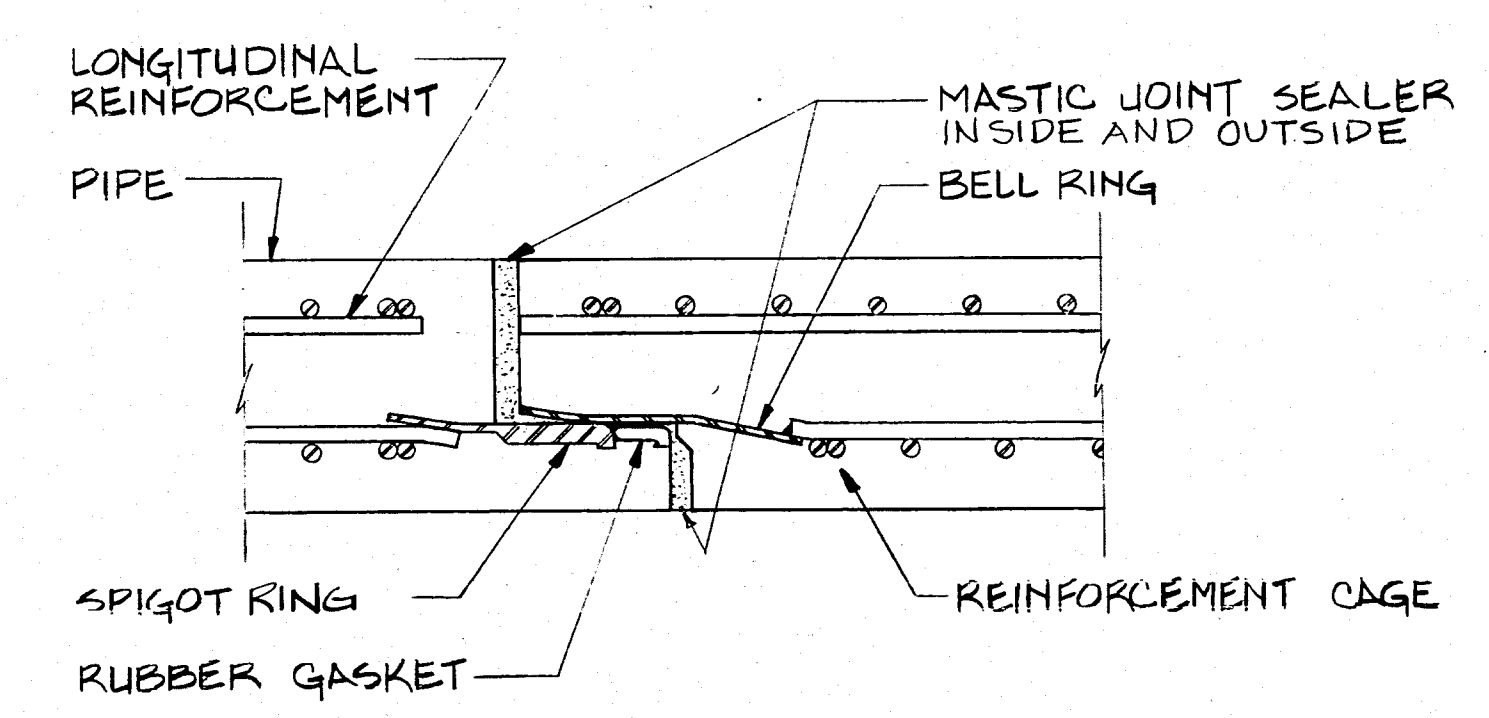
DETAIL OF PRIMARY SPILLWAY PIPE CONDUIT (A/5)
